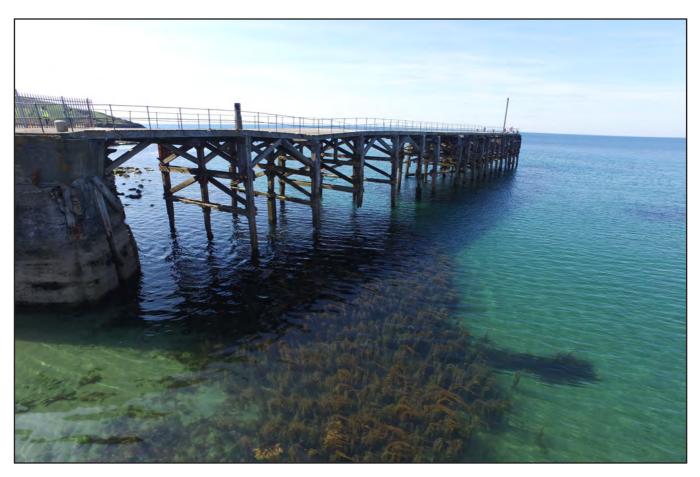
View of north-northwest side of Trefor pier shoiwng rotted timber in the intertidal zone, most notably on Truss 17 (UAV image: DJI_0233)
